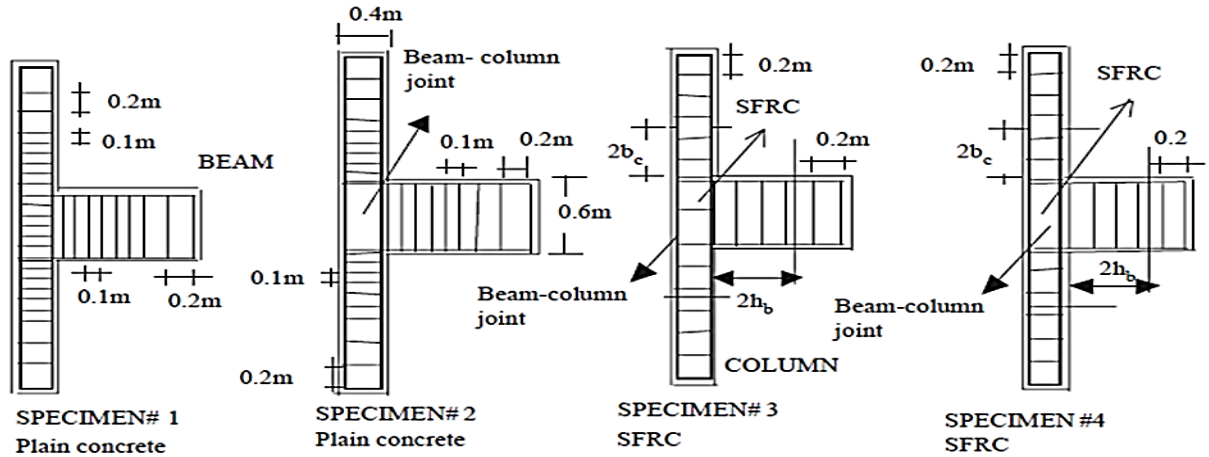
Dimensions and reinforcement of the test specimens [31]
